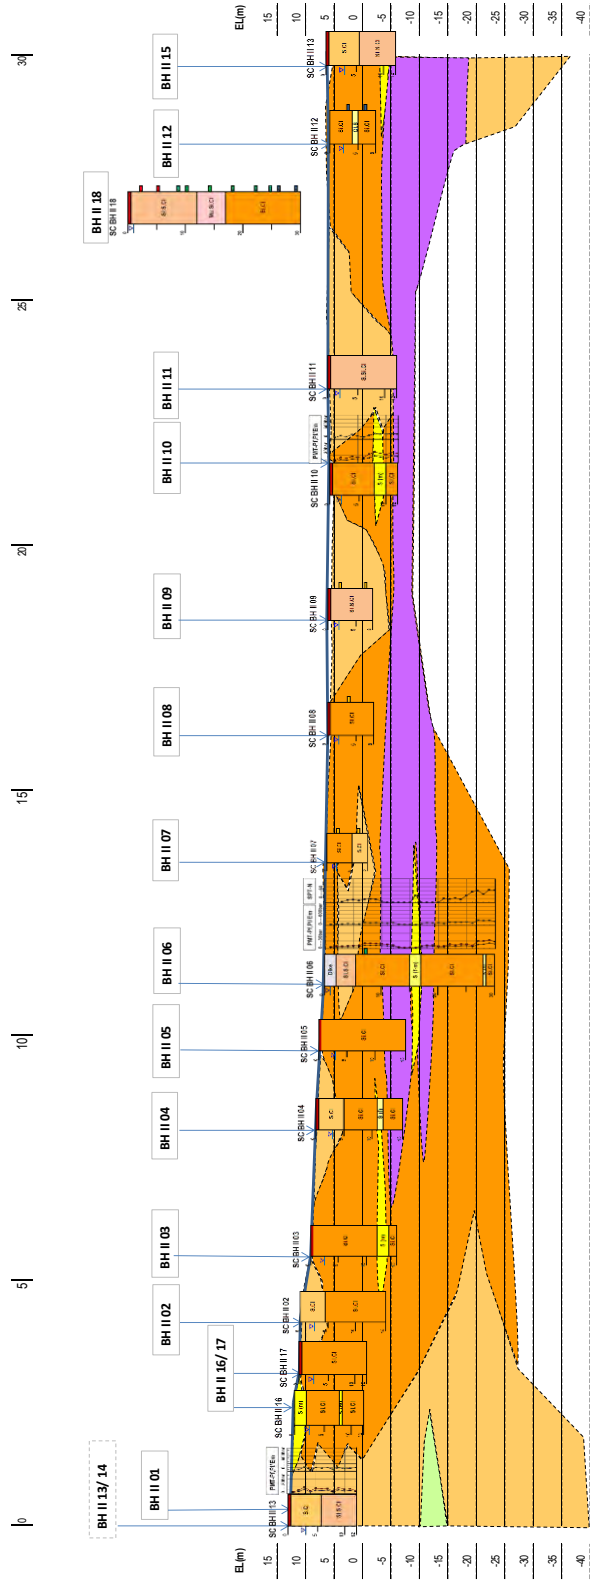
Geotechnical Longitudinal Section of Driving Channel, Retarding Basin and Drainage Channel of El Mabtough (Indication of Soft Ground) (B-B')
